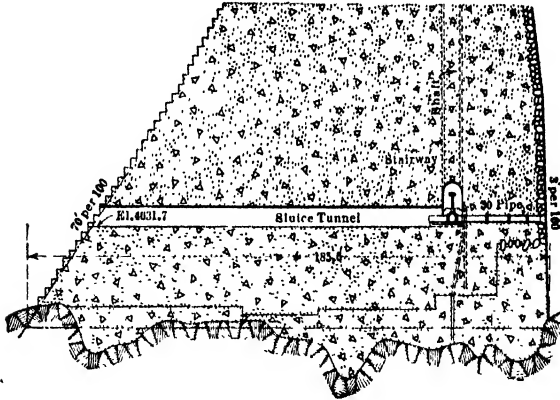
Section through solid dam showing sluice way, longitudinal tunnels and entrance shaft.
